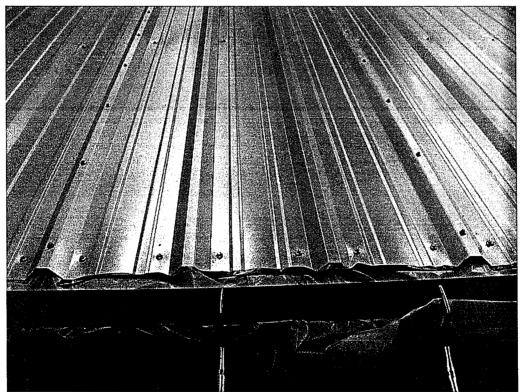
View of the 26 ga. PBR panel attachment at end and interior supports. (DSC00062)
